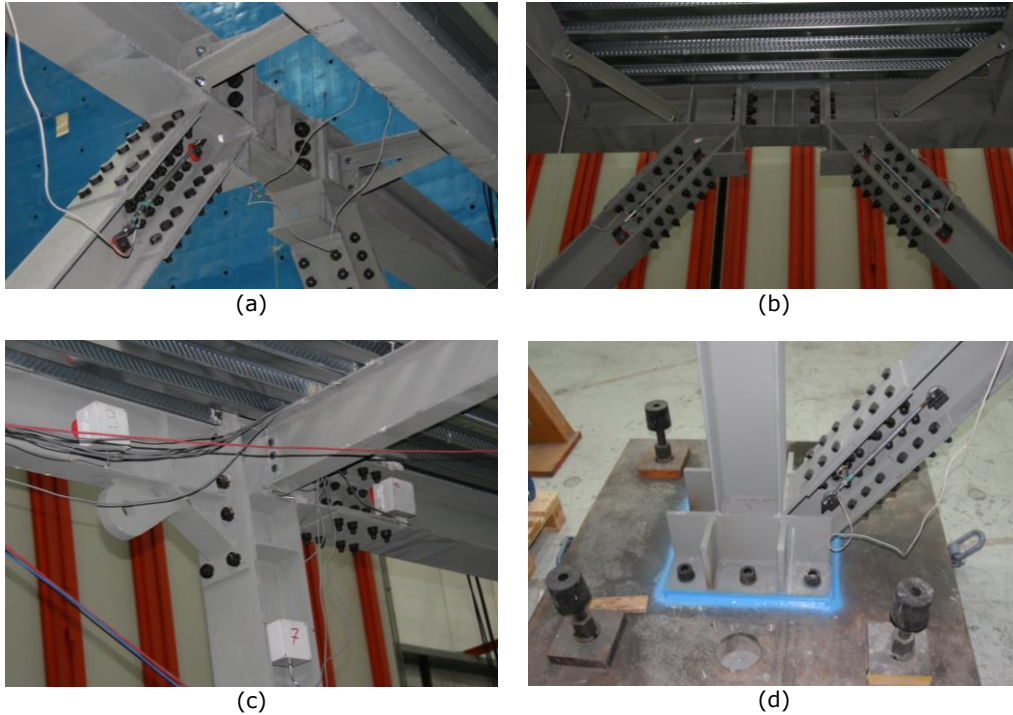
Structural details: (a) South frame link, (b) North frame link, beams to column connection and (d) column base connection.
